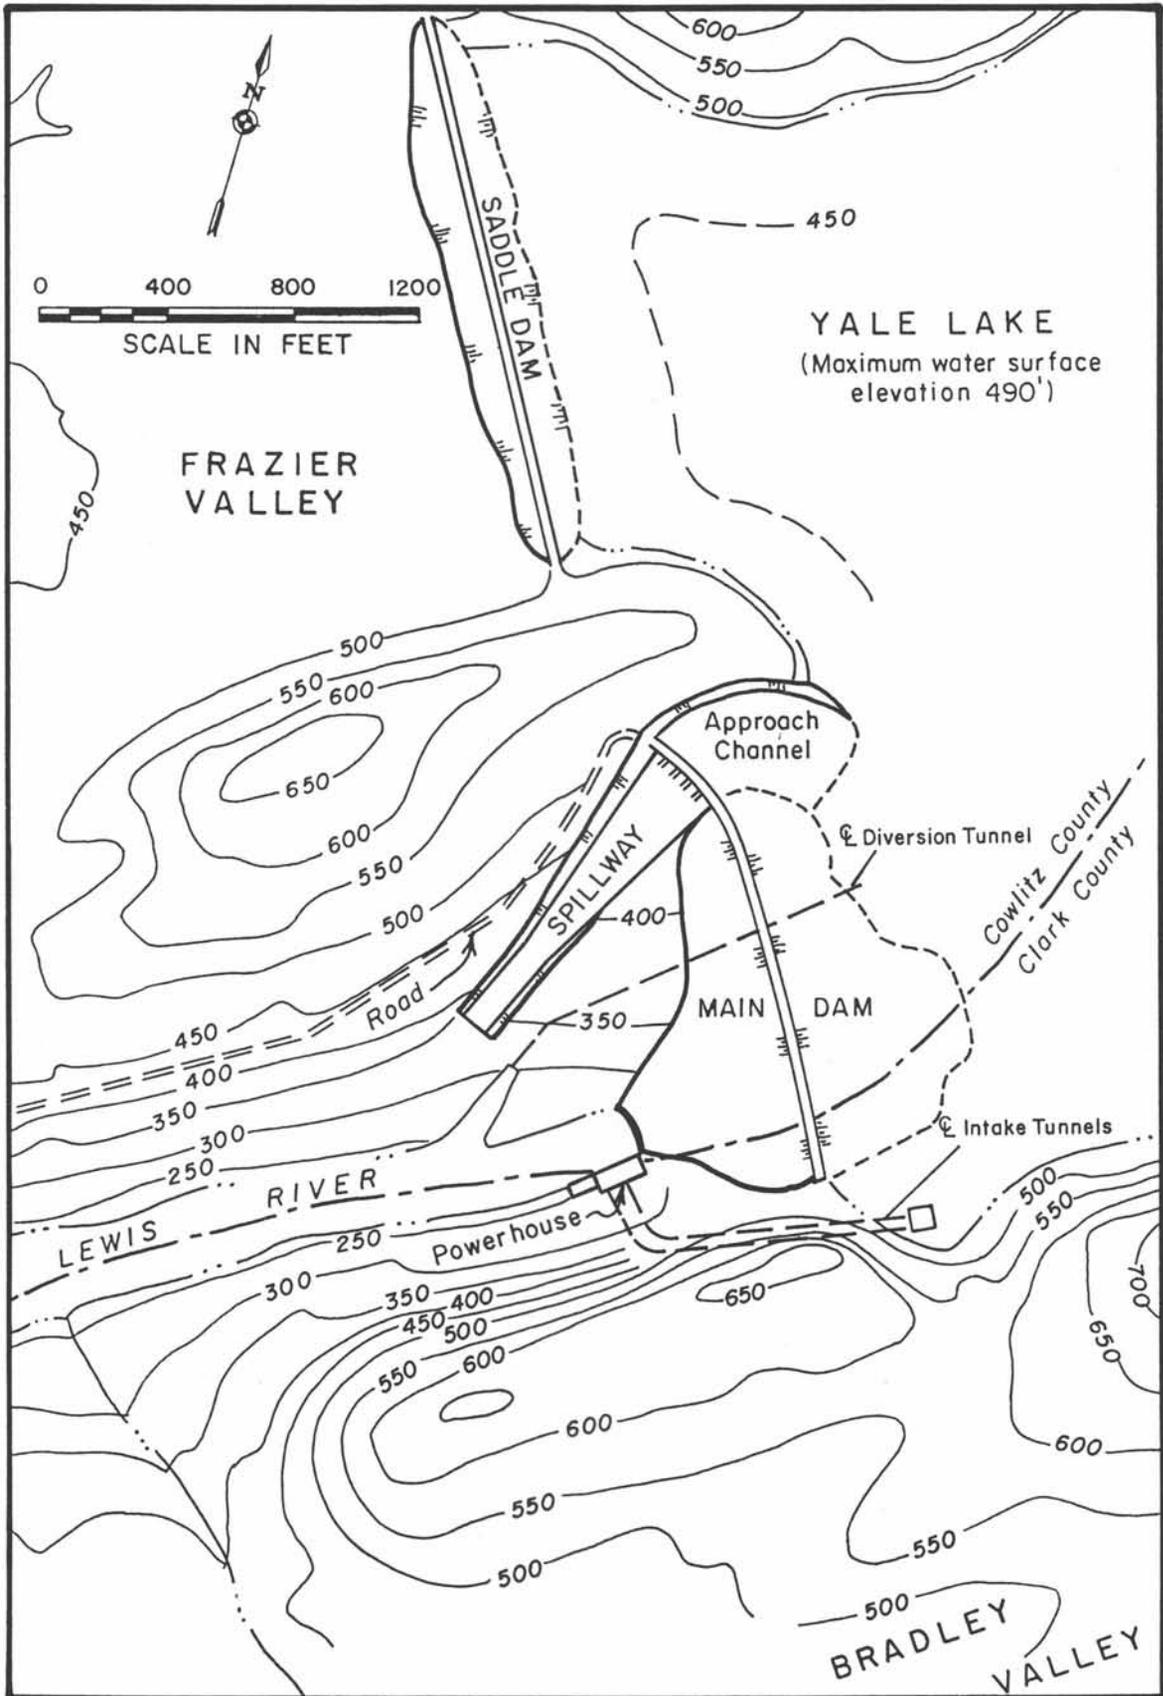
General plan of structures at Yale Dam. From Williams (1930).
